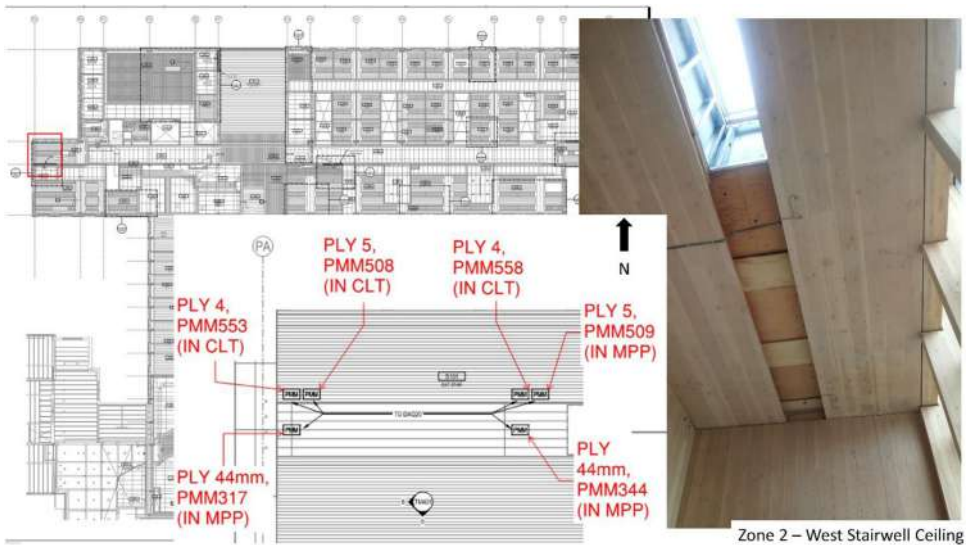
Example as-built photos of Zone 2 - West Stairwell Ceiling.
